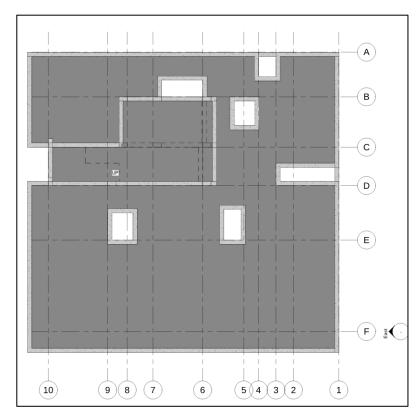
Structural Drawing For Level 3 (Third Floor)
